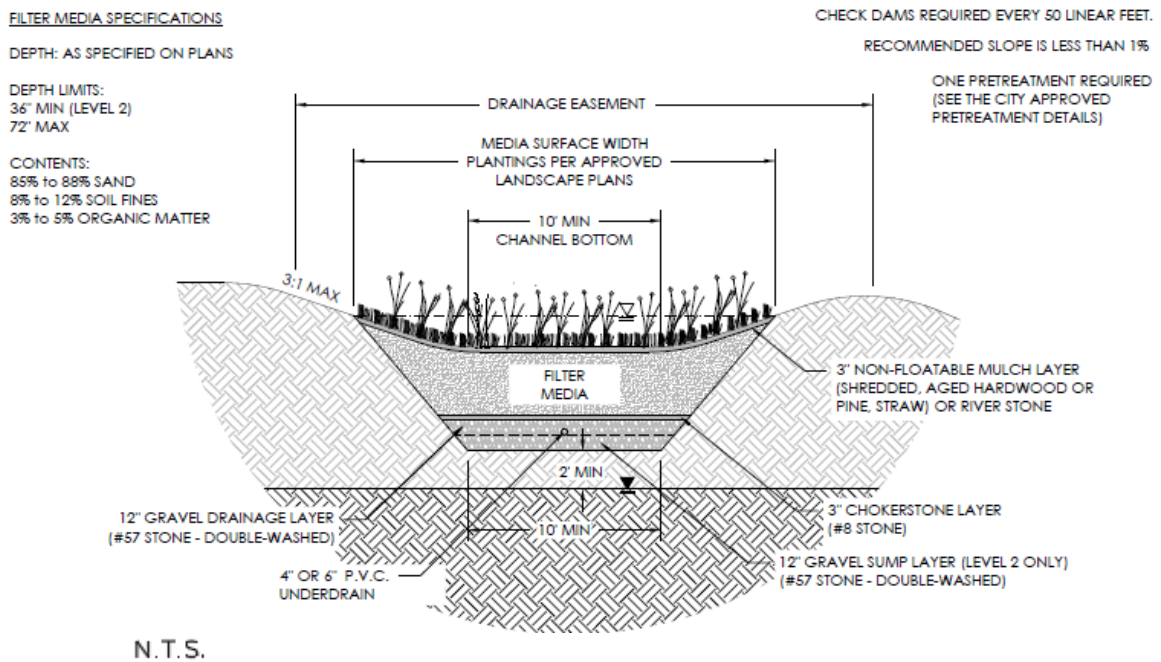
Typical Detail for Level 2 Water Quality Swale
